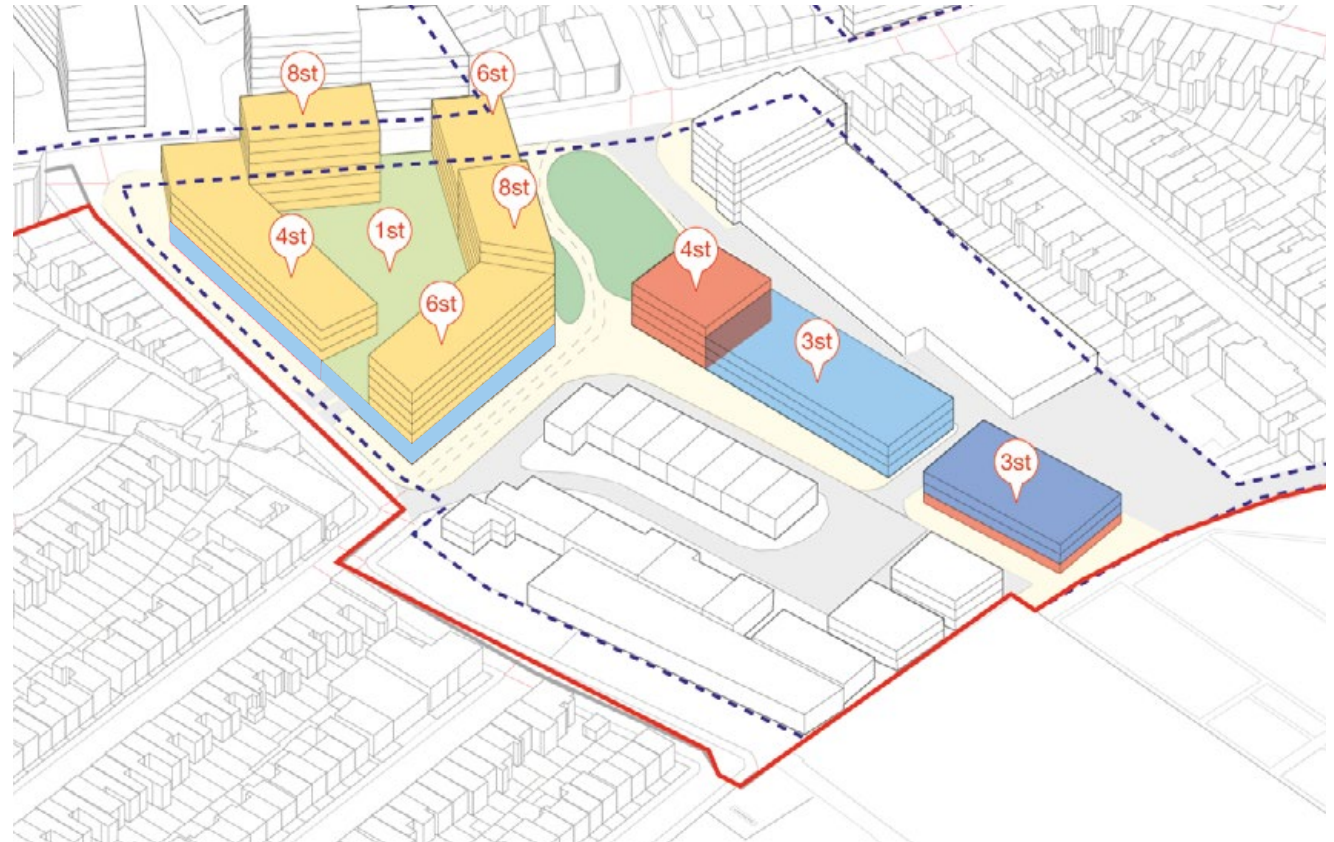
Proposed Massing BSSA2 indicating 3-8 storeys (9m-24m).
